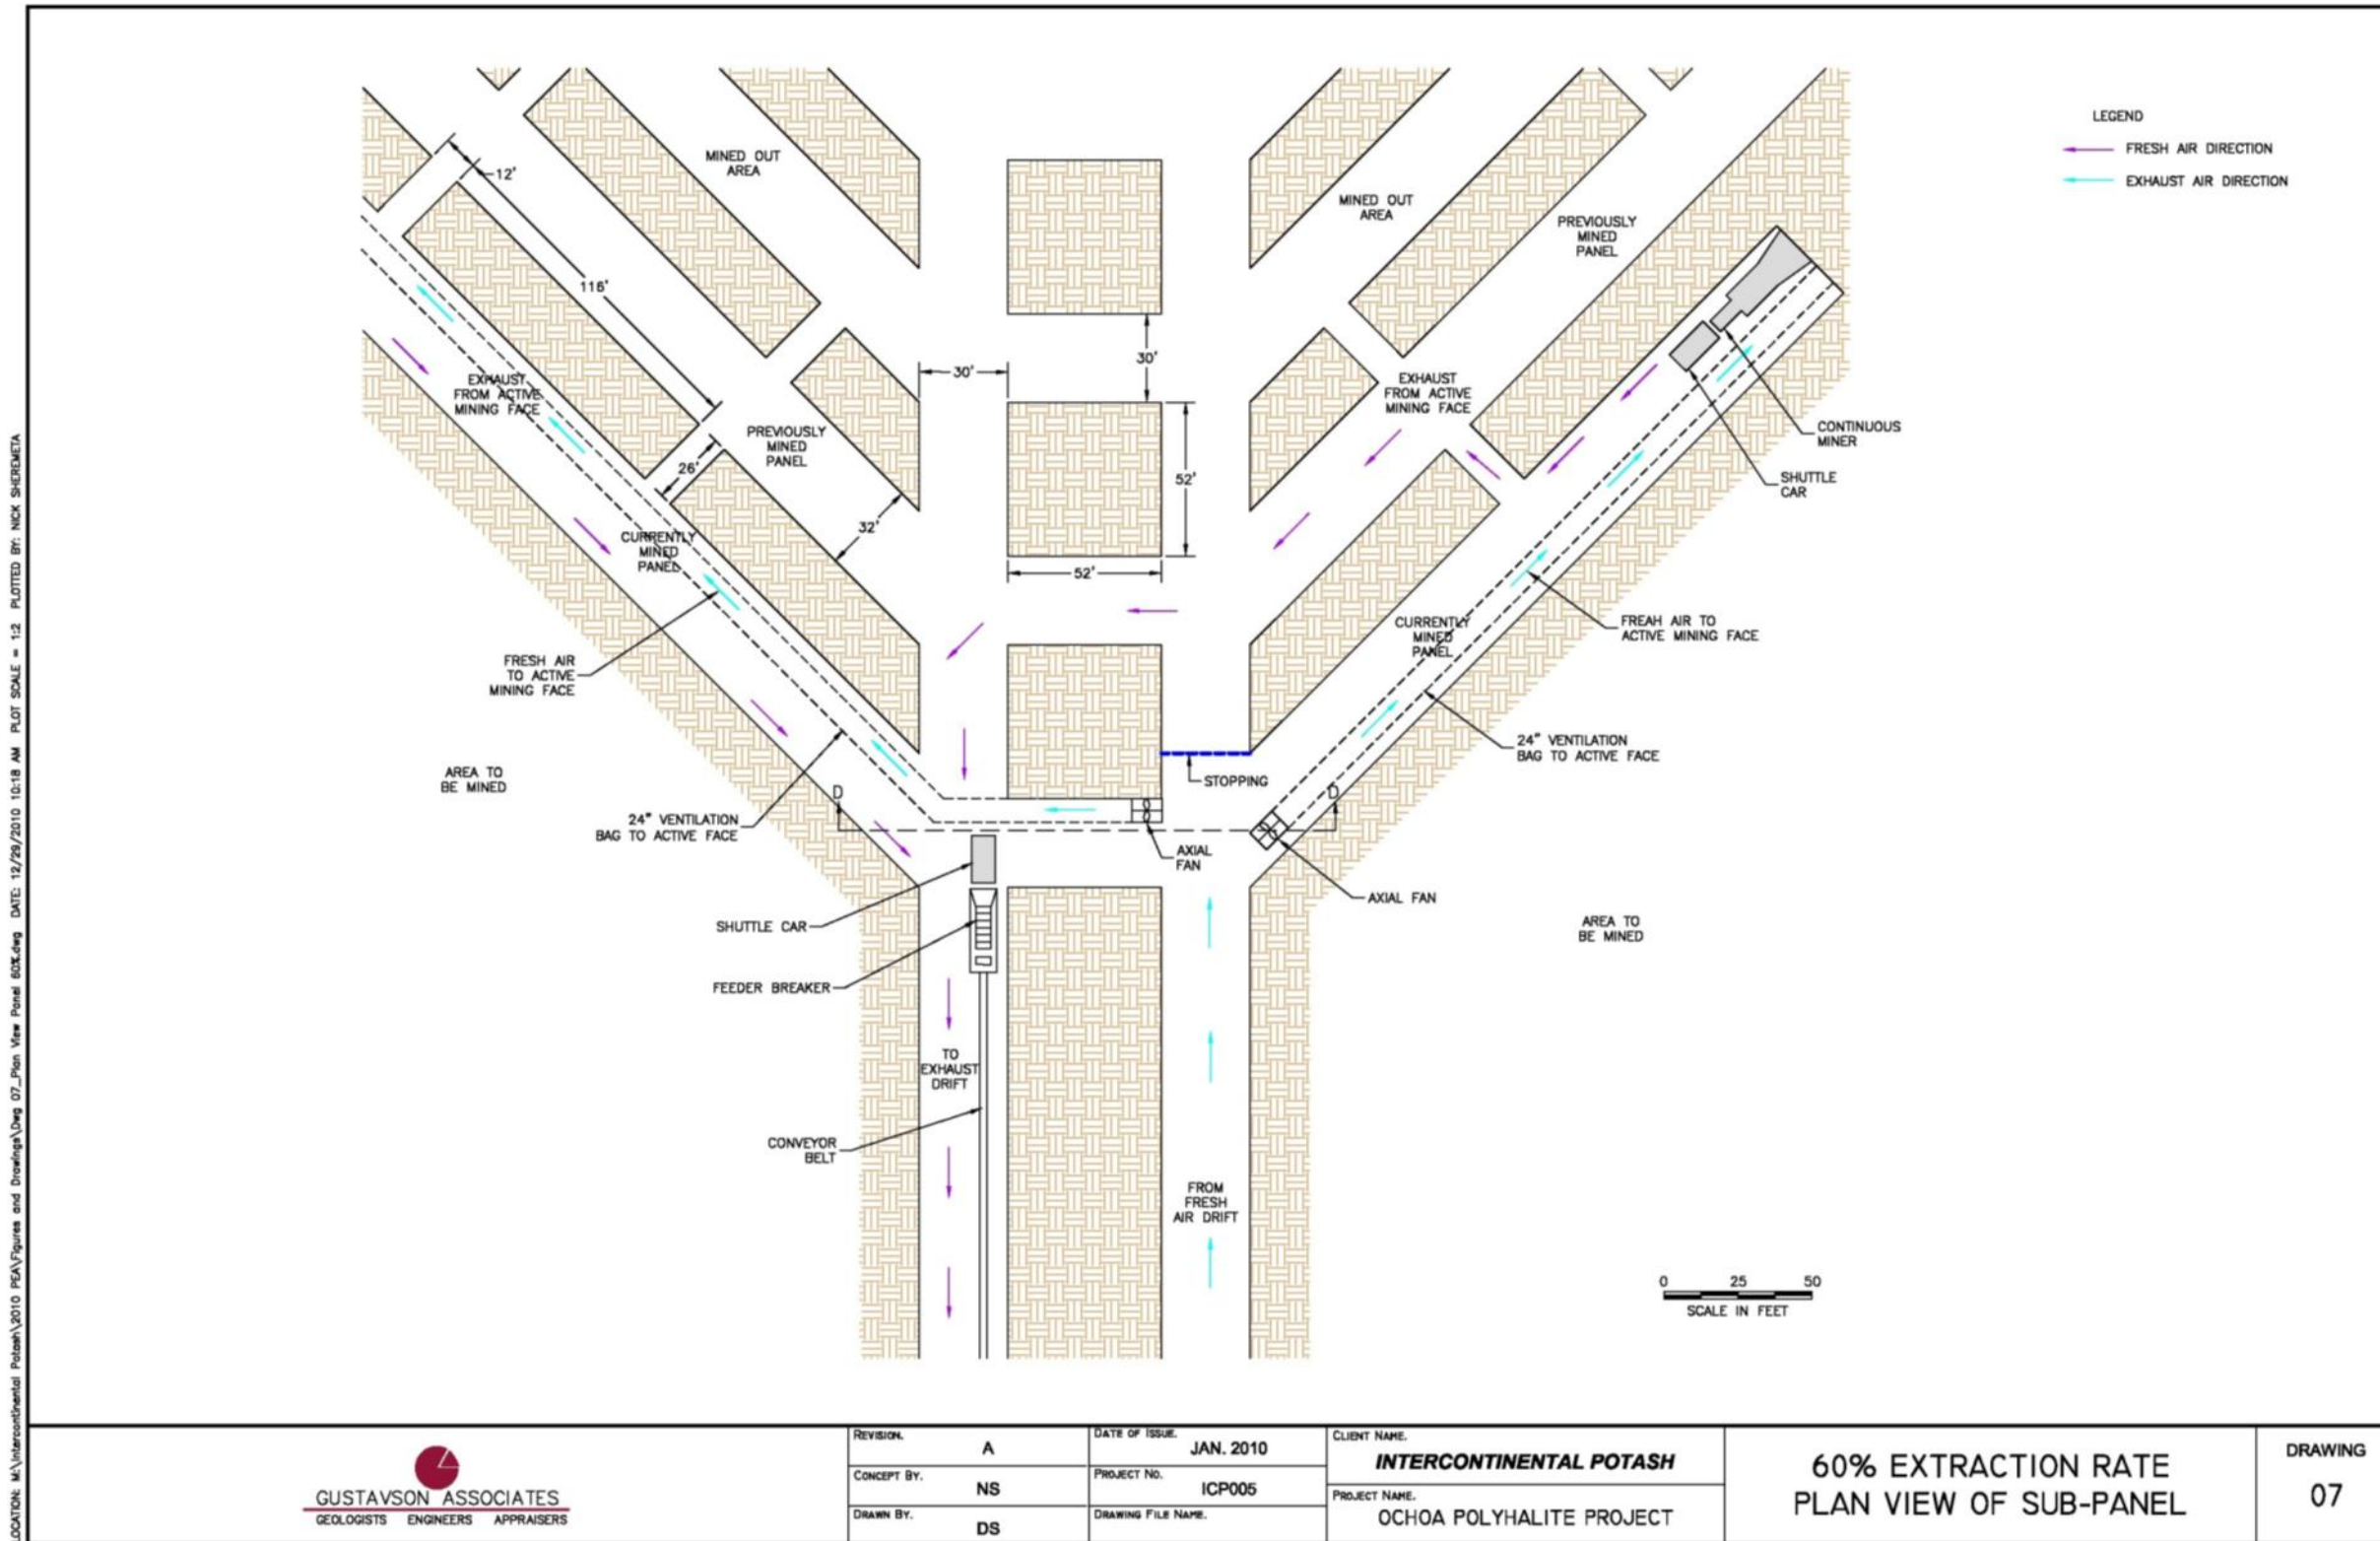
60% EXTRACTION RATE PLAN VIEW OF SUB-PANEL
